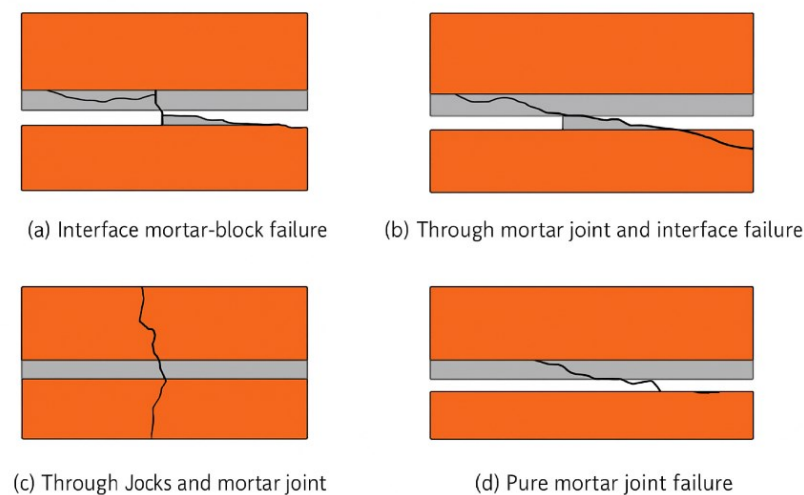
Typical Failure Modes Observed in Masonry Assemblies Under Shear Loading.
